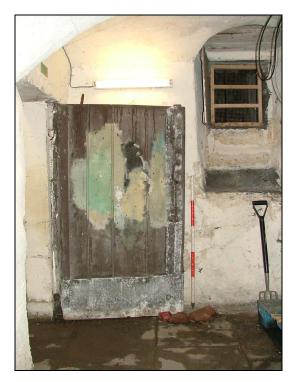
Door to northern cellar room showing repair work using metal sheets (Scale = 1m)
